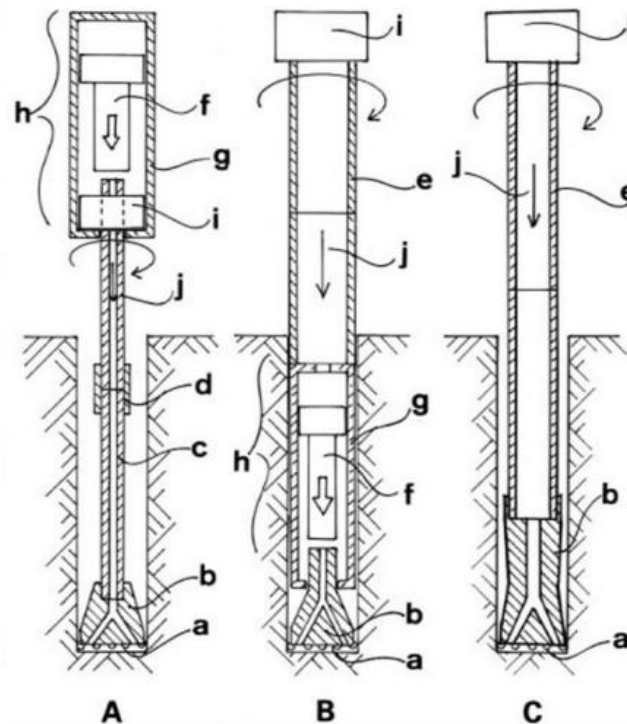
Schematic drawing of 3 types of drills A) Top hammer, B) Down-the-hole, C) Simple Rotary Drill with (a) tip, (b) bit, (c) rod, (d) sleeve, (e) drill pipe, (f) piston, (g) cylinder, (h) percussion mechanism, (i) rotation mechanism and (j) flushing from Watanabe (2)
